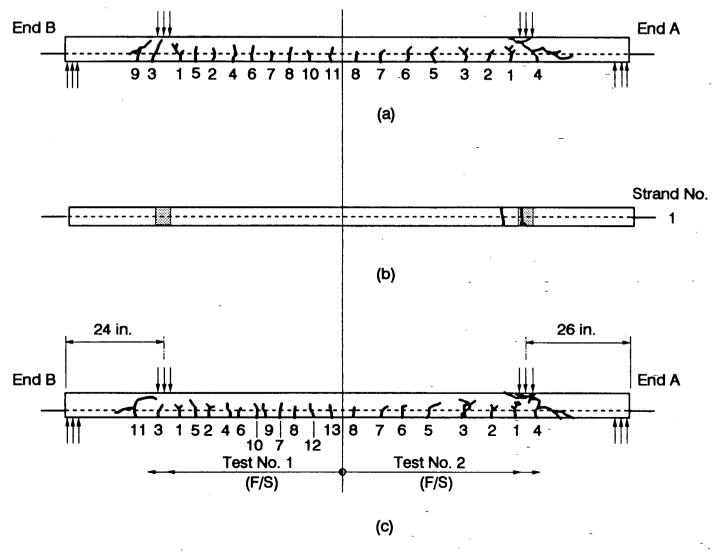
Crack patterns for D-type Specimen No. 17-6.0DC-1:
